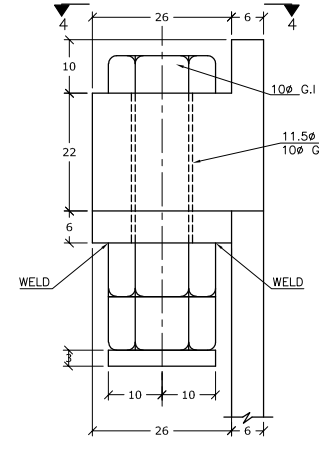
DETAILS OF CRASH BARRIER (FOR GENERAL ARRANGEMENT)
